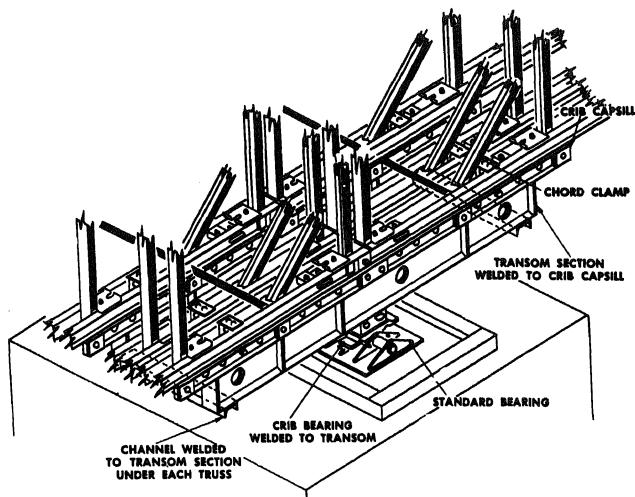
Rocker bearing to support five panel support points made from crib capsill, transom section, and crib bearing.
